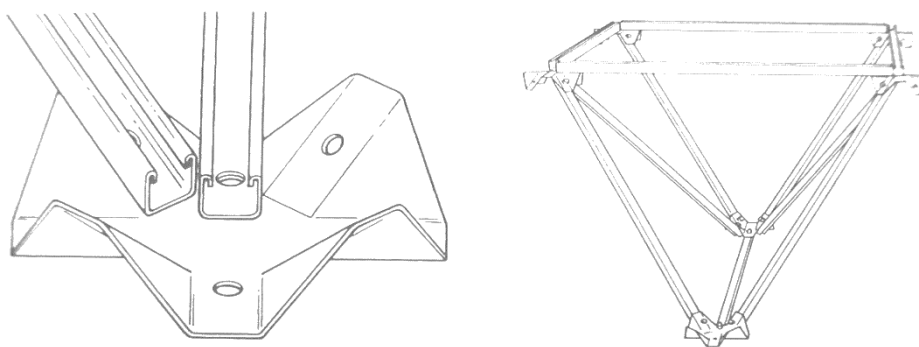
Detail Example of the Connection Joints in Space Frame Structure as Known as *Unistruf* System
